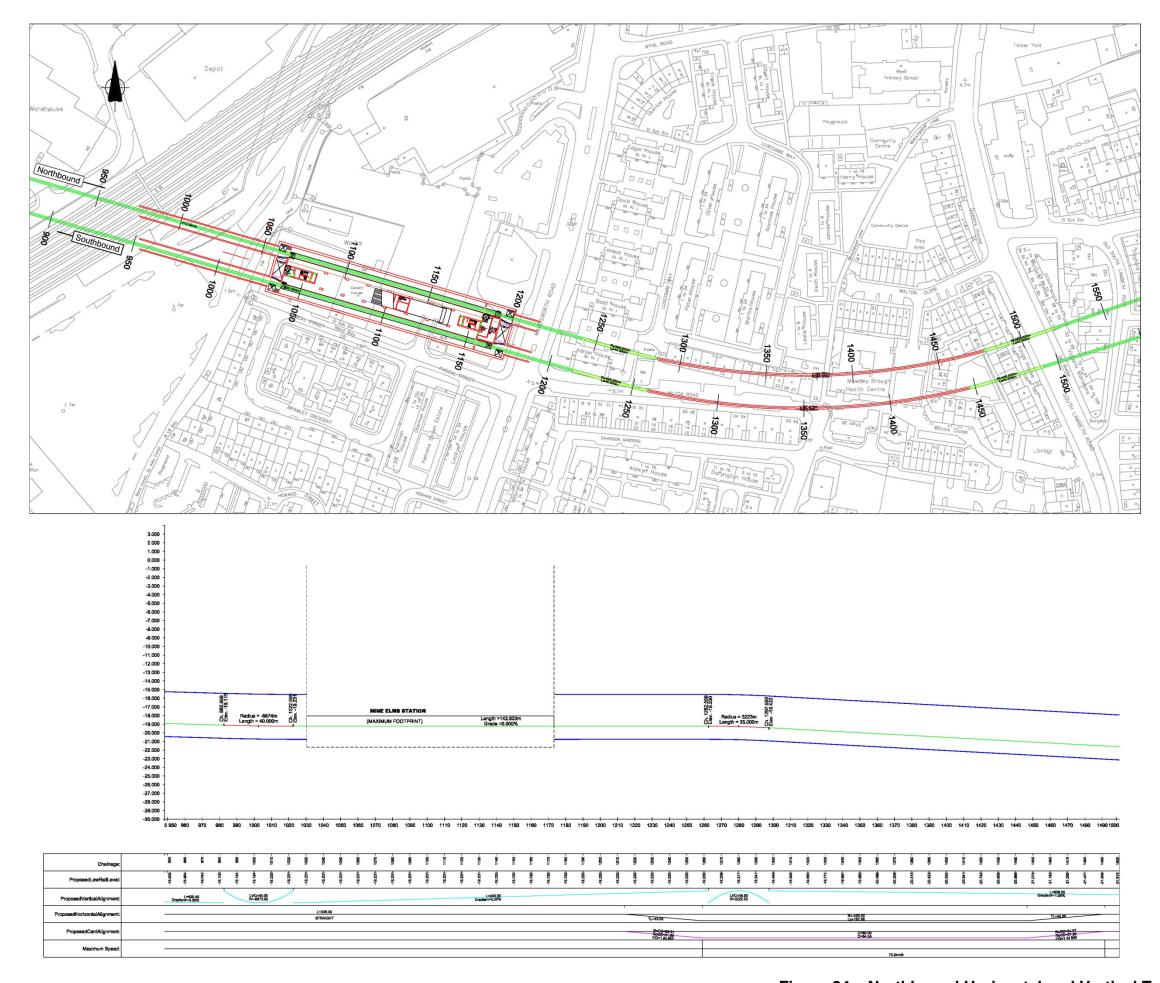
Northbound Horizontal and Vertical Track Alignment Sheet 9
